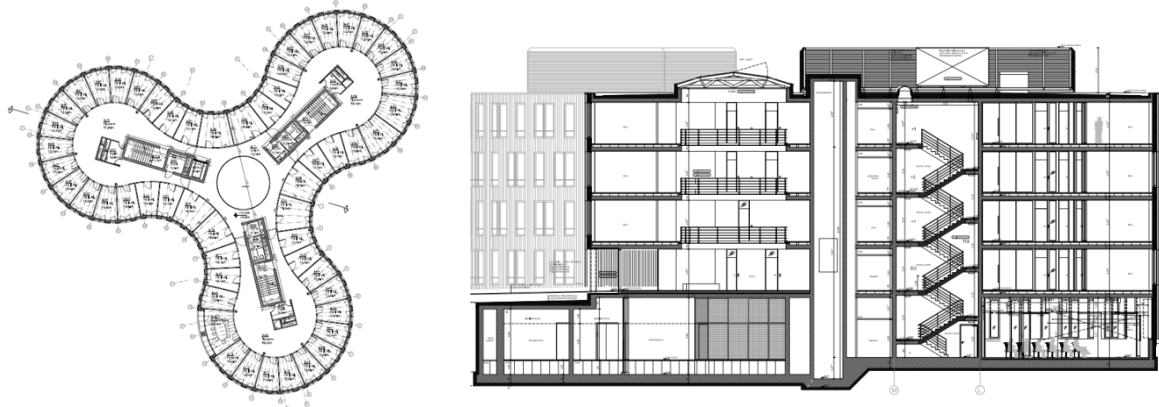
Groundplan shape and vertical cut of the building (2nd floor). Offices and meeting rooms are located at the facade, the atrium lies in the centre. The three cylinders contain staircases, sanitary, copy and tea rooms.
